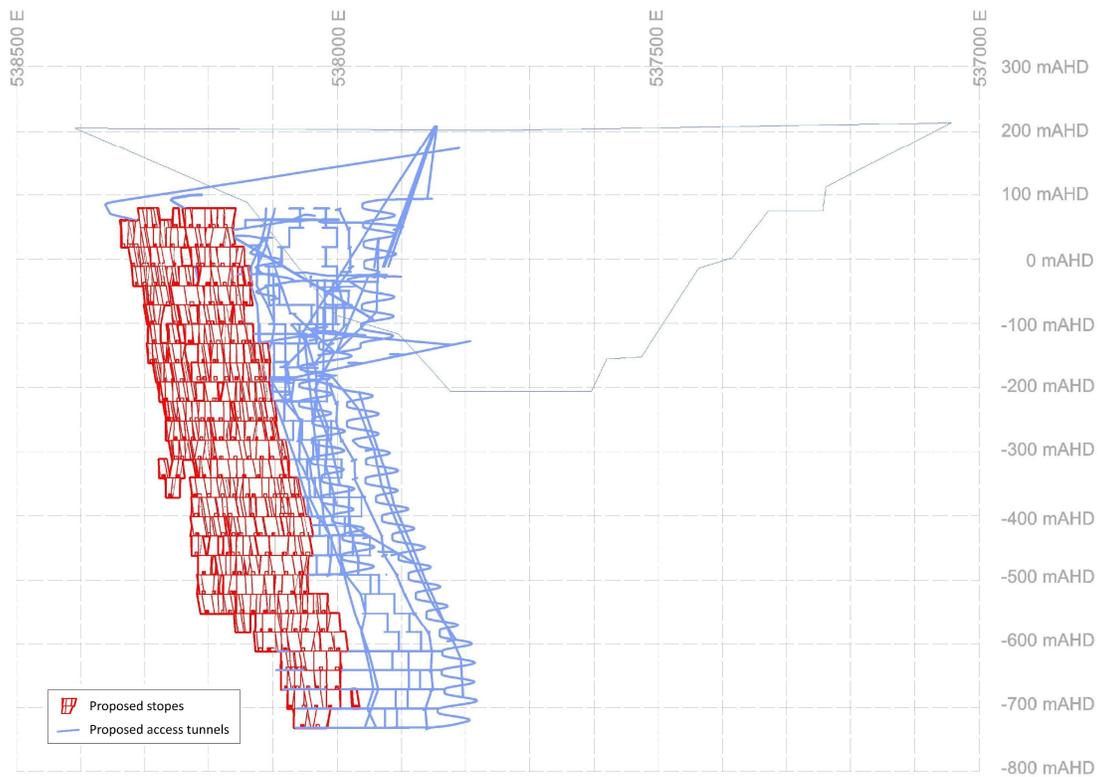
Stopes and access tunnels - elevation view looking south (Eastings in m MGA Zone 55)
